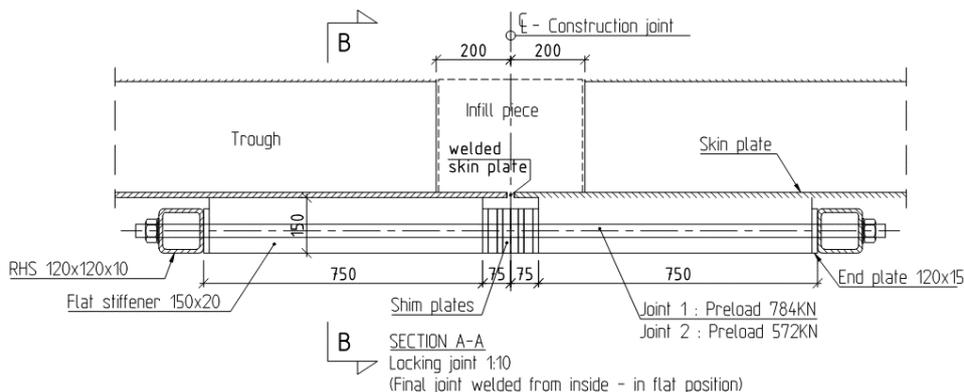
Locking joint for web- and bottom plates, construction joint 1 & 2, longitudinal section
